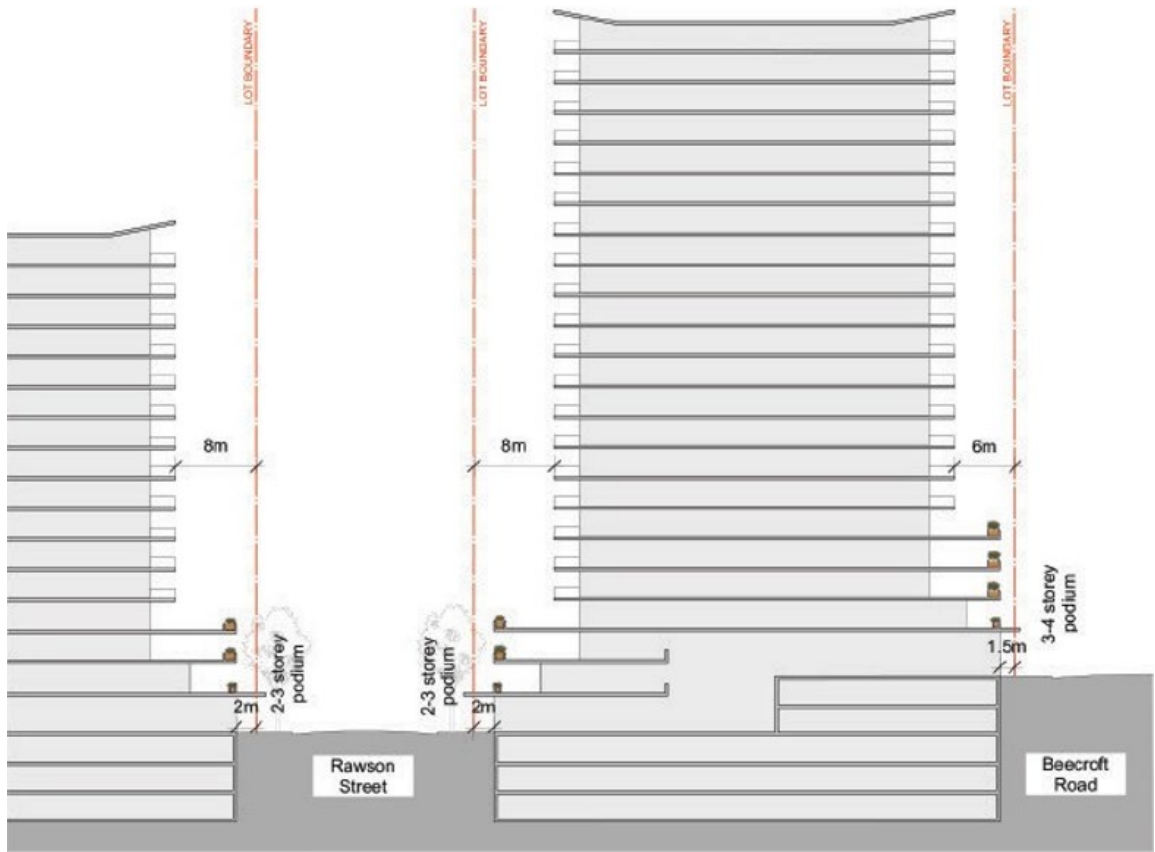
Setbacks to Rawson Street and Beecroft Road
